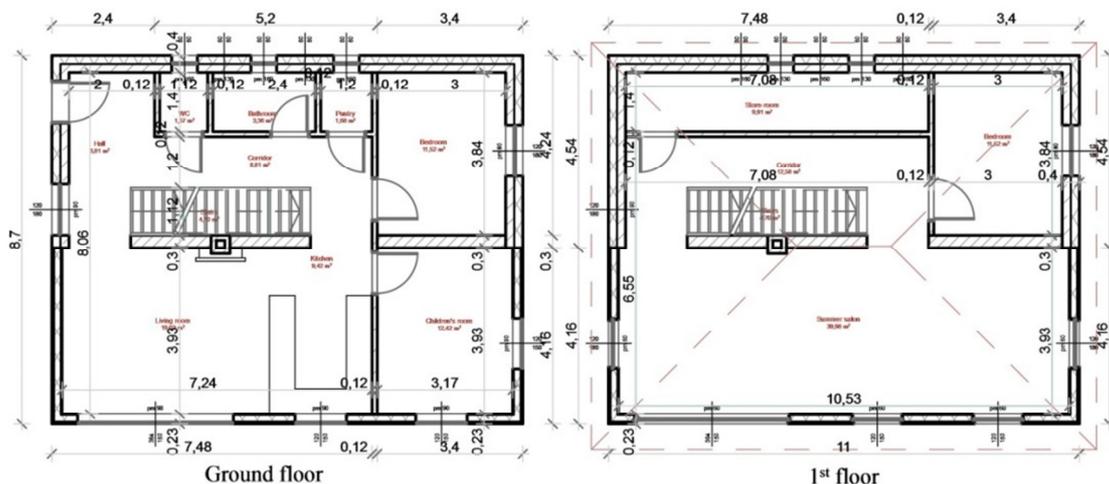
Layout of the house. The position of the materials is changing depending on variants but not the size and organisation of the house. In this variant, North faces are made of concrete and Southern facades are of wood.
